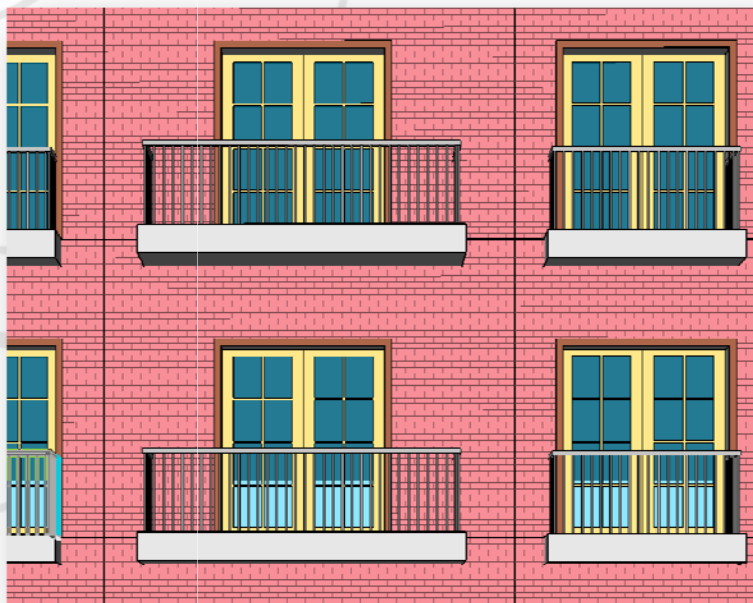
B: West Building Close-up Render of Thin Brick Precast Panel Façade
